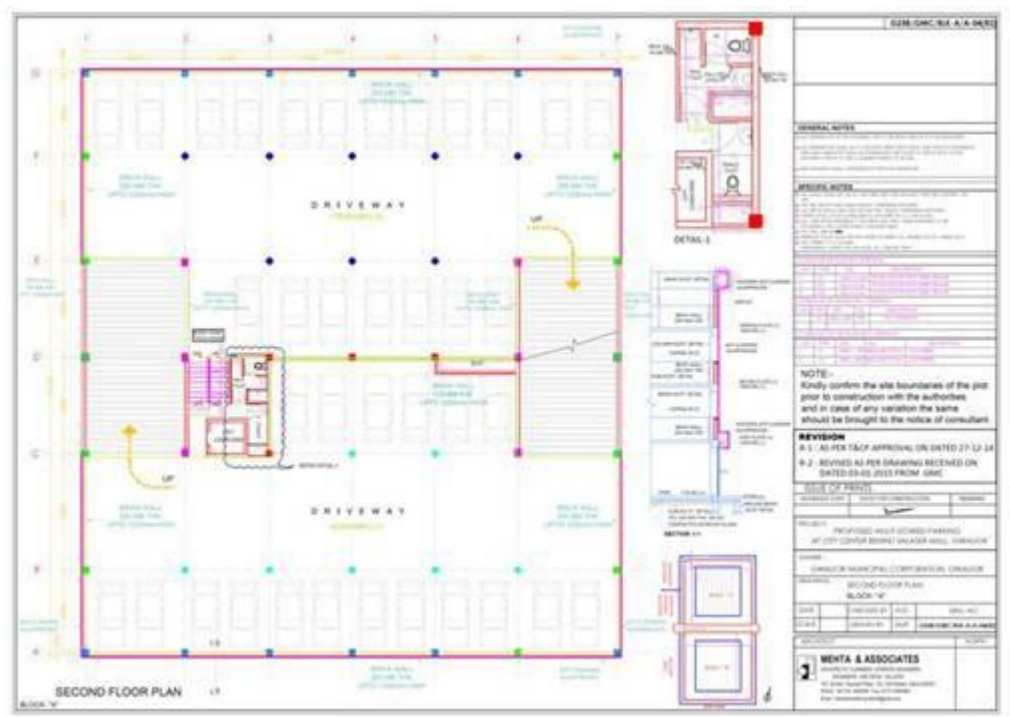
Parking Location: Salasar Multi Level Parking (Second Floor-Block A)
